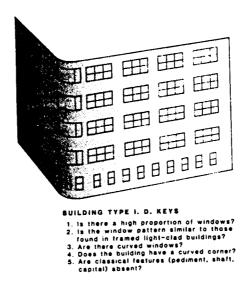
Framed Construction — Heavy Clad (Modern style variation).
